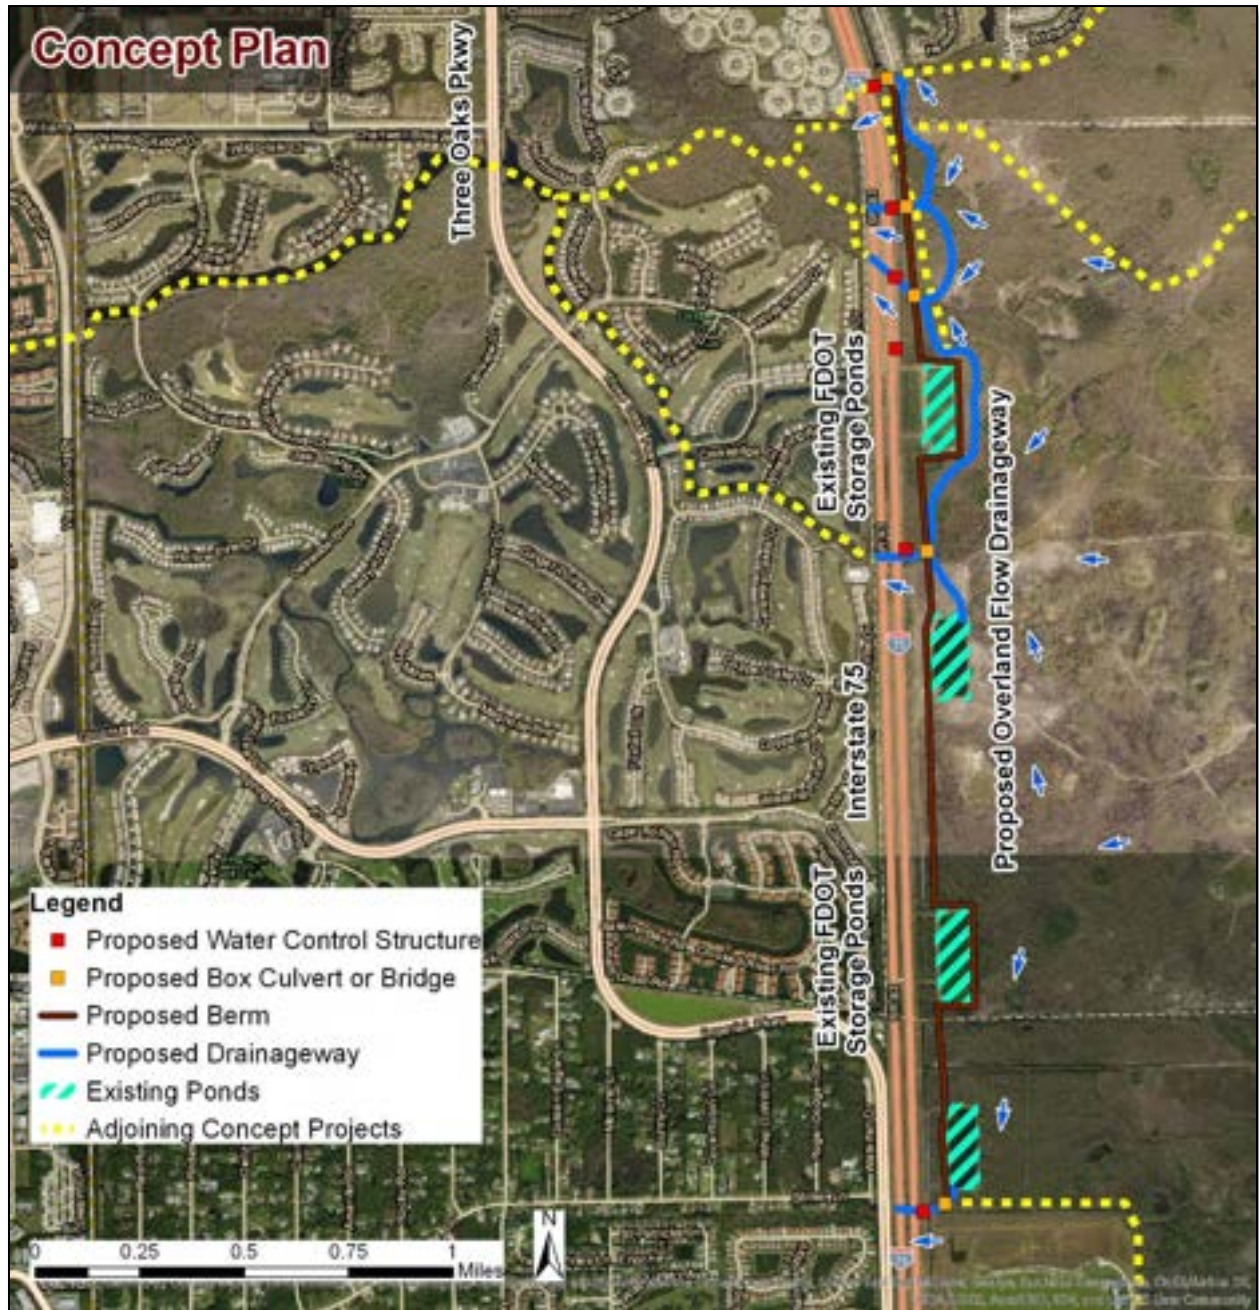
Concept Plan, 1.3.11 East I-75 Overland Flow Collection Drainageway
